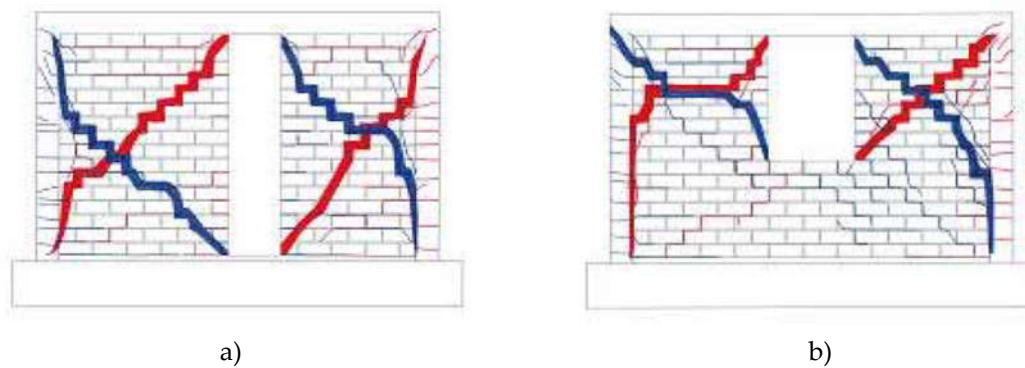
Failure mechanisms of CM walls with openings: a) door openings and b) window openings [115].
